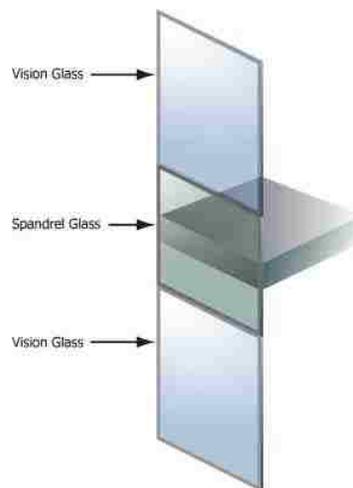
The spandrel glass is covering floor structure, ceiling plenums [47]
